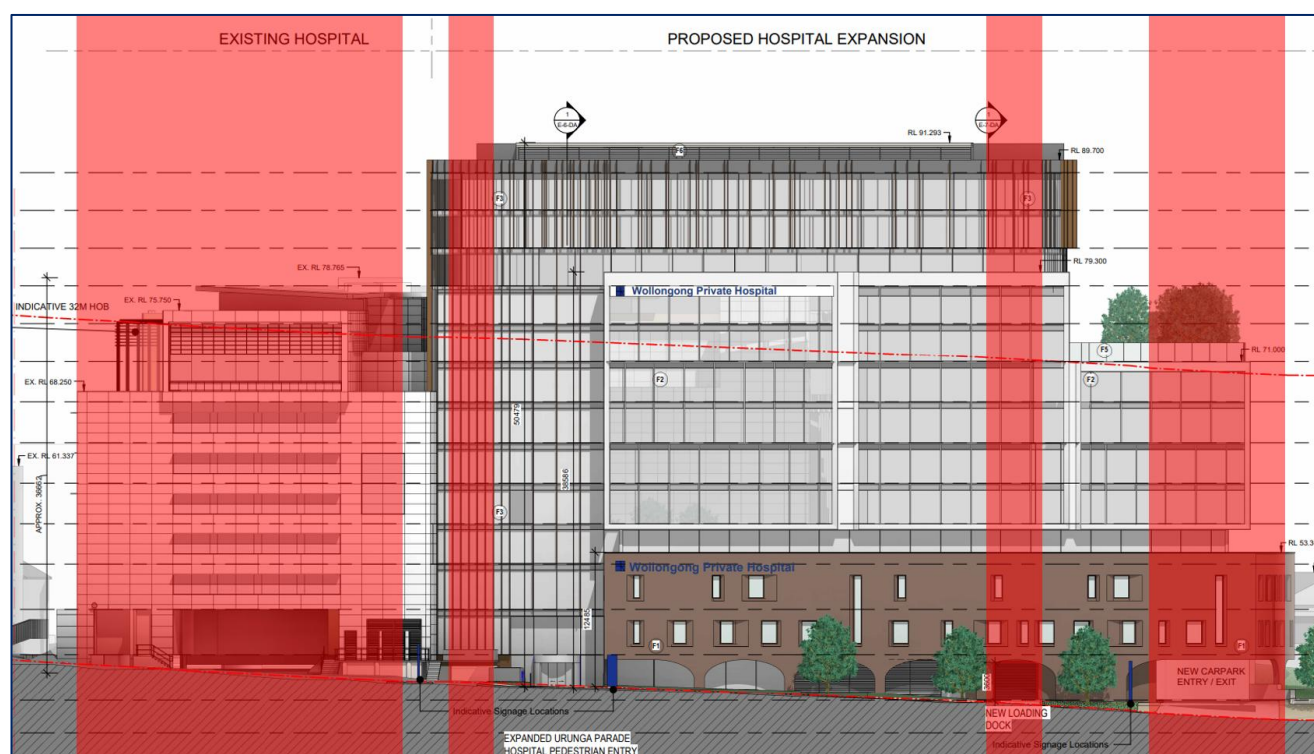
| Extent of the Urunga Parade frontage occupied by driveway crossovers highlighted red (Base source: Architectural Plans)
